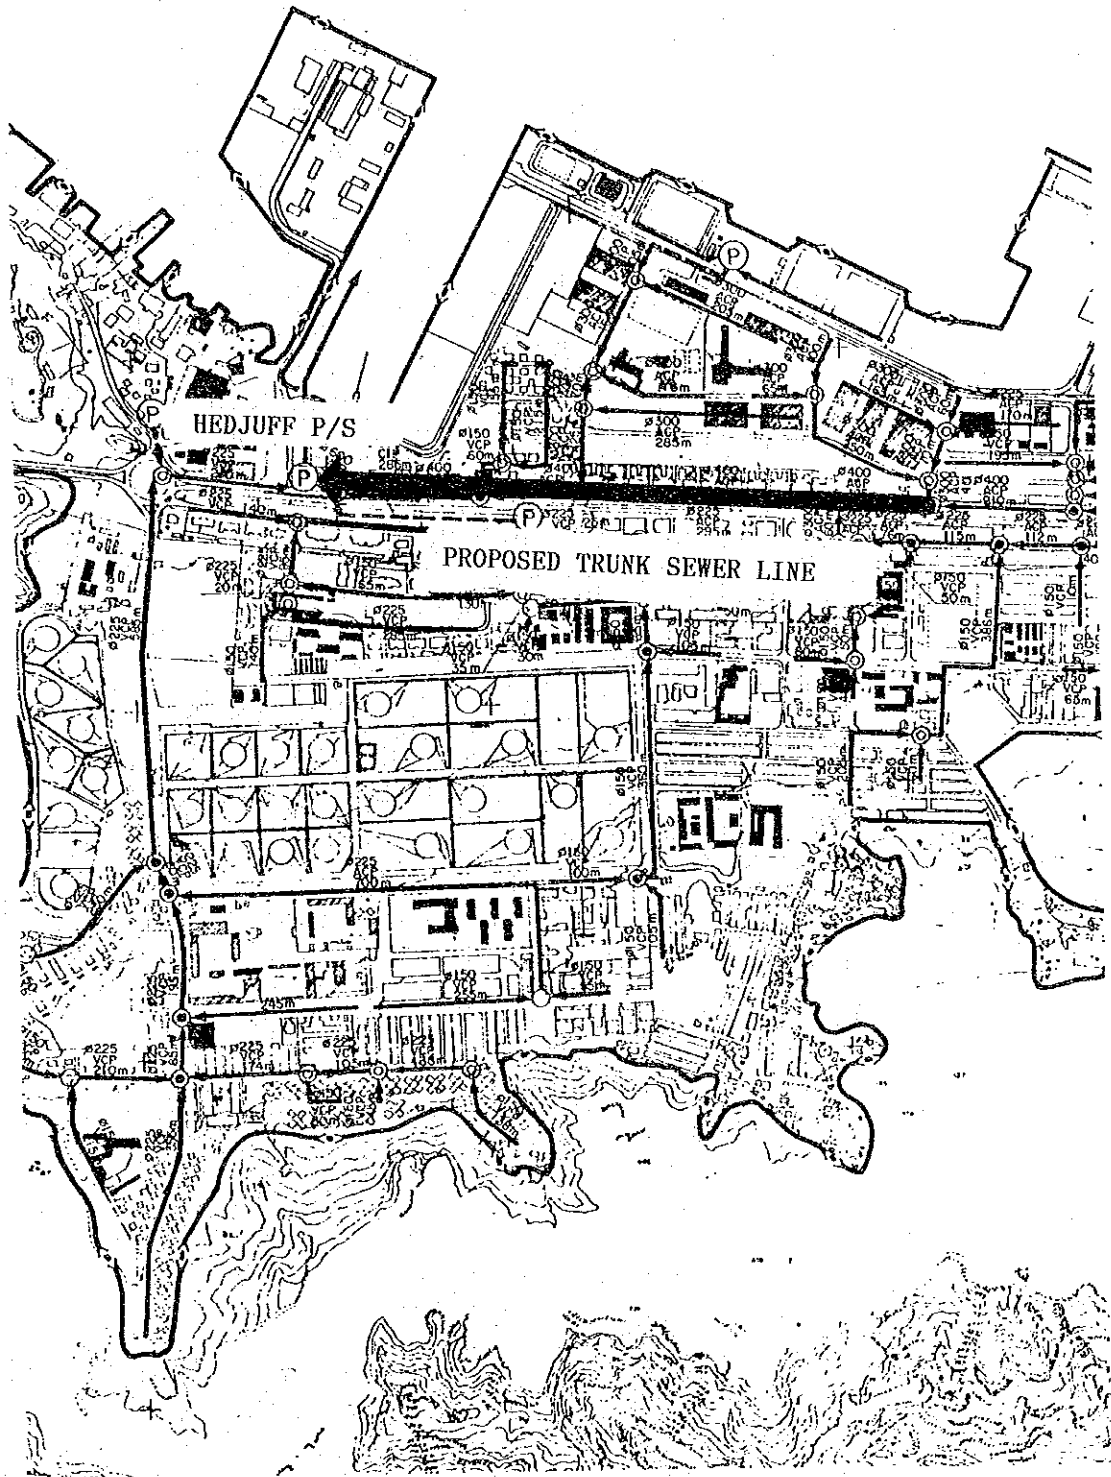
Proposed Trunk Sewer Line in Ma'alla District
